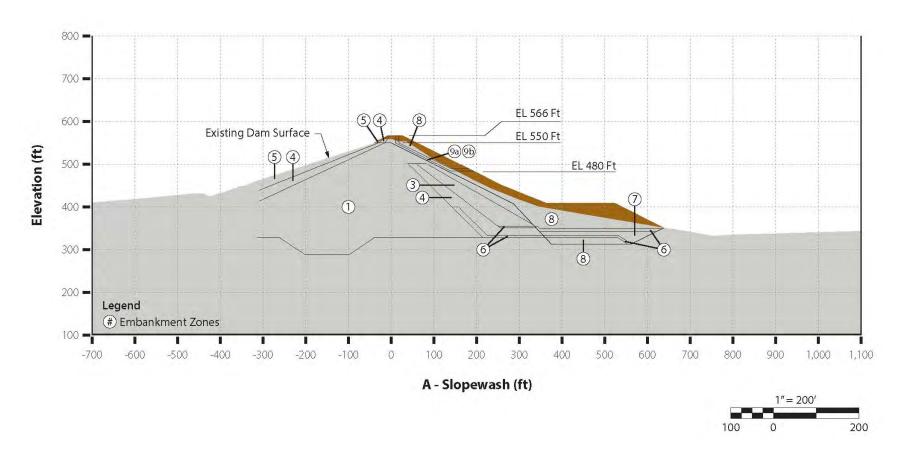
Dam Raise Typical Cross-Section, Embankment Materials and Zones
